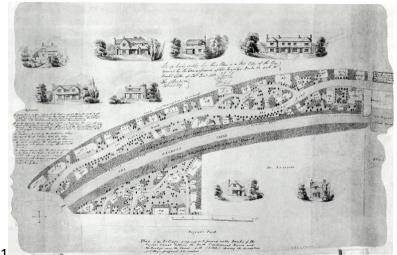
John Nash original plan for Park Village, 1823 (Tyack, 1993)
